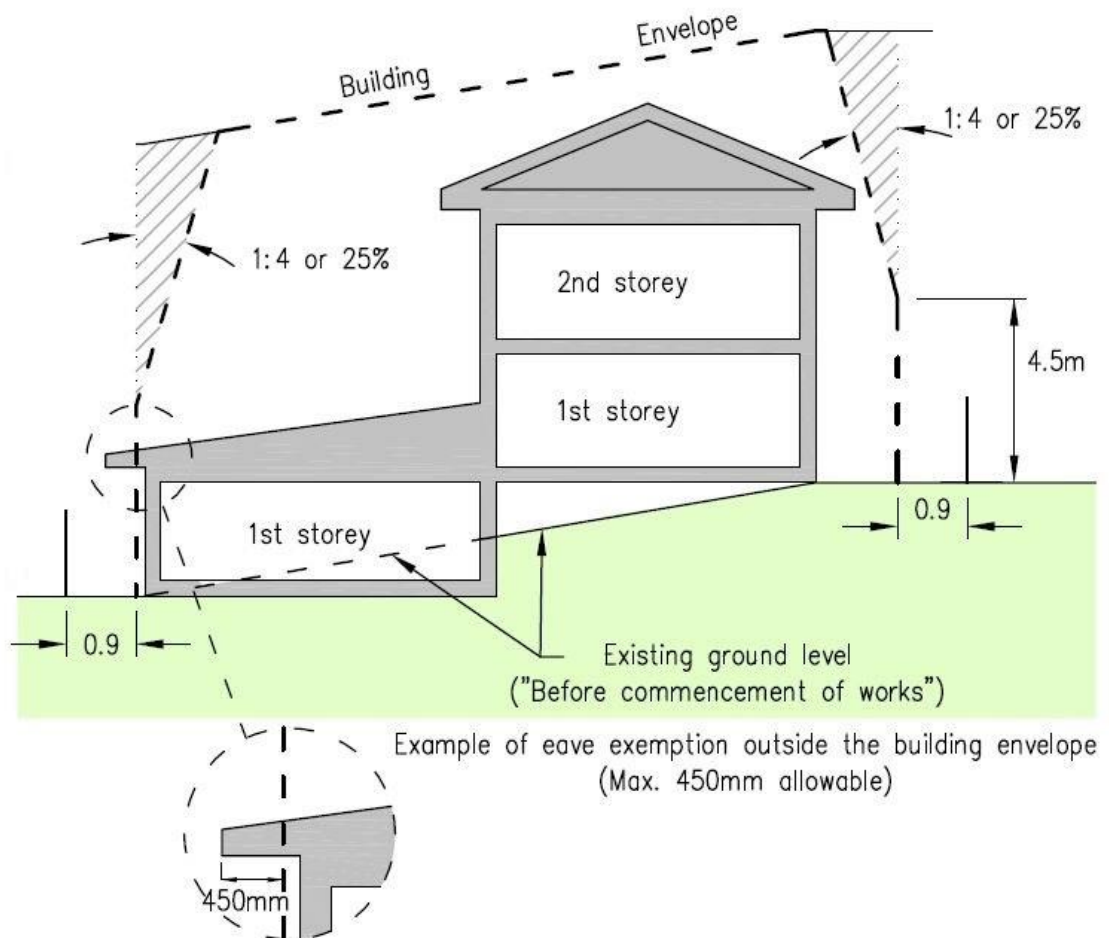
Side Setback Building Envelope Explanation (residential sized allotments)
